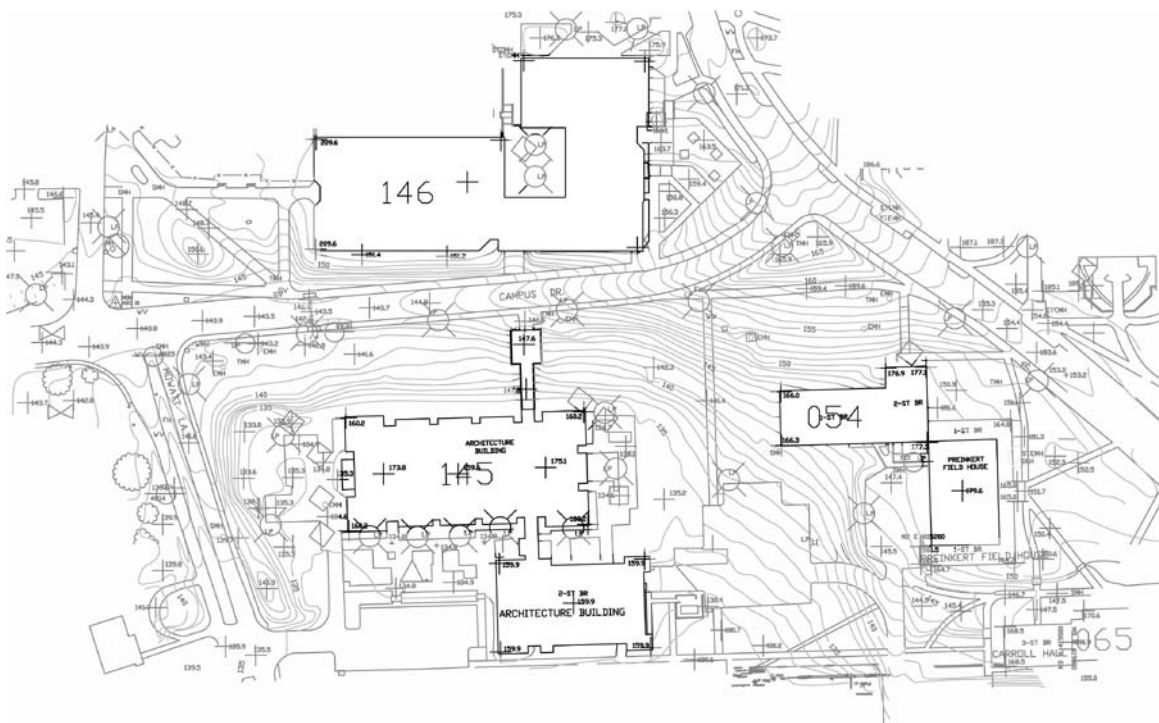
Location of Campus Drive inside the proposed site. (Author's graphic)
